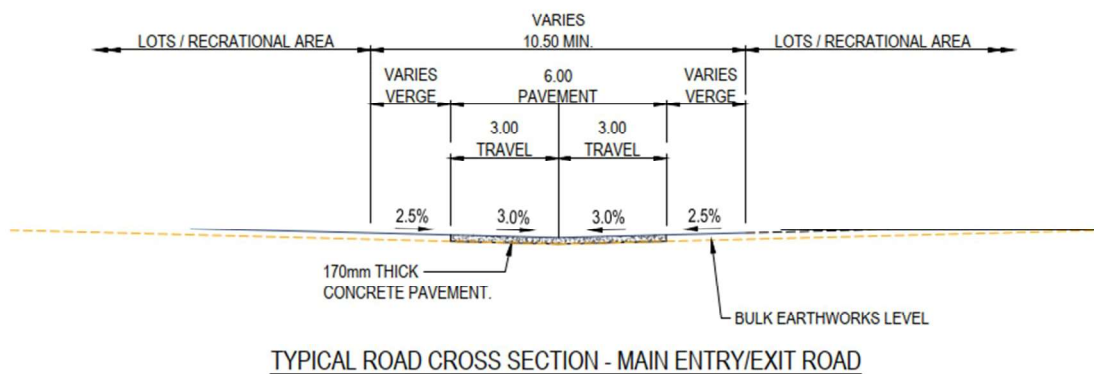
ENTRY/EXIT ROAD SECTION
